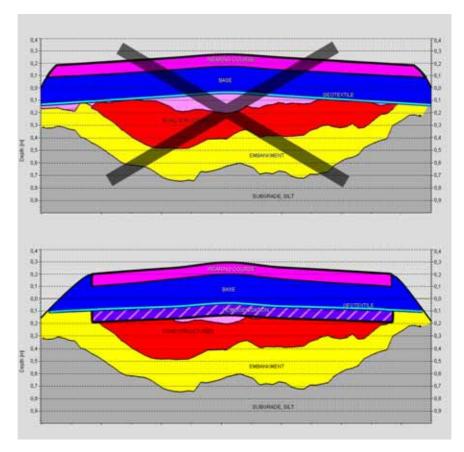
Typical cross-section that will fail and a cross section showing how strengthening should be done.
